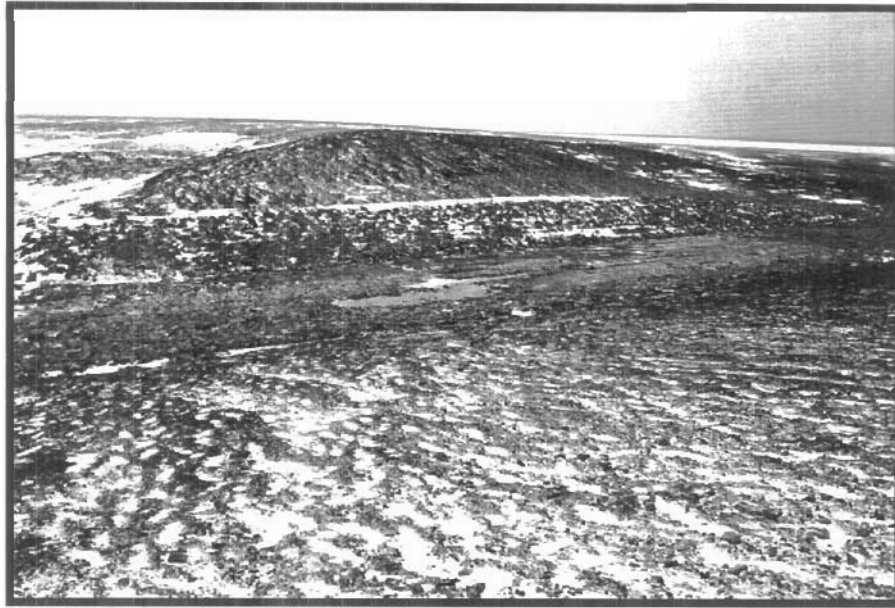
Garrow Lake Dam breach. View across channel to left abutment area.
